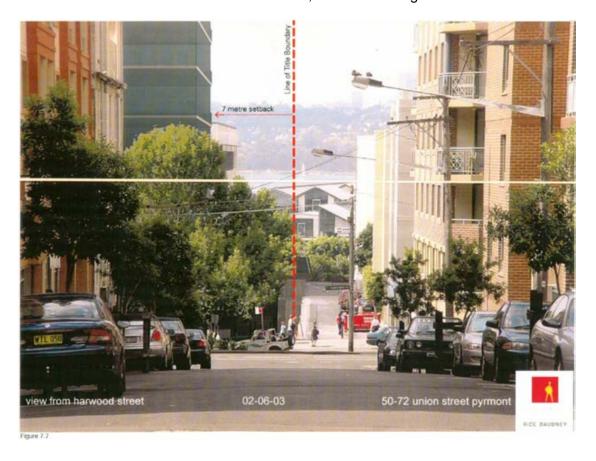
Harwood Street view corridor [source: Approved Plans for 60 Union Street (previously 50-72 Union) – R2004/00011-02]
